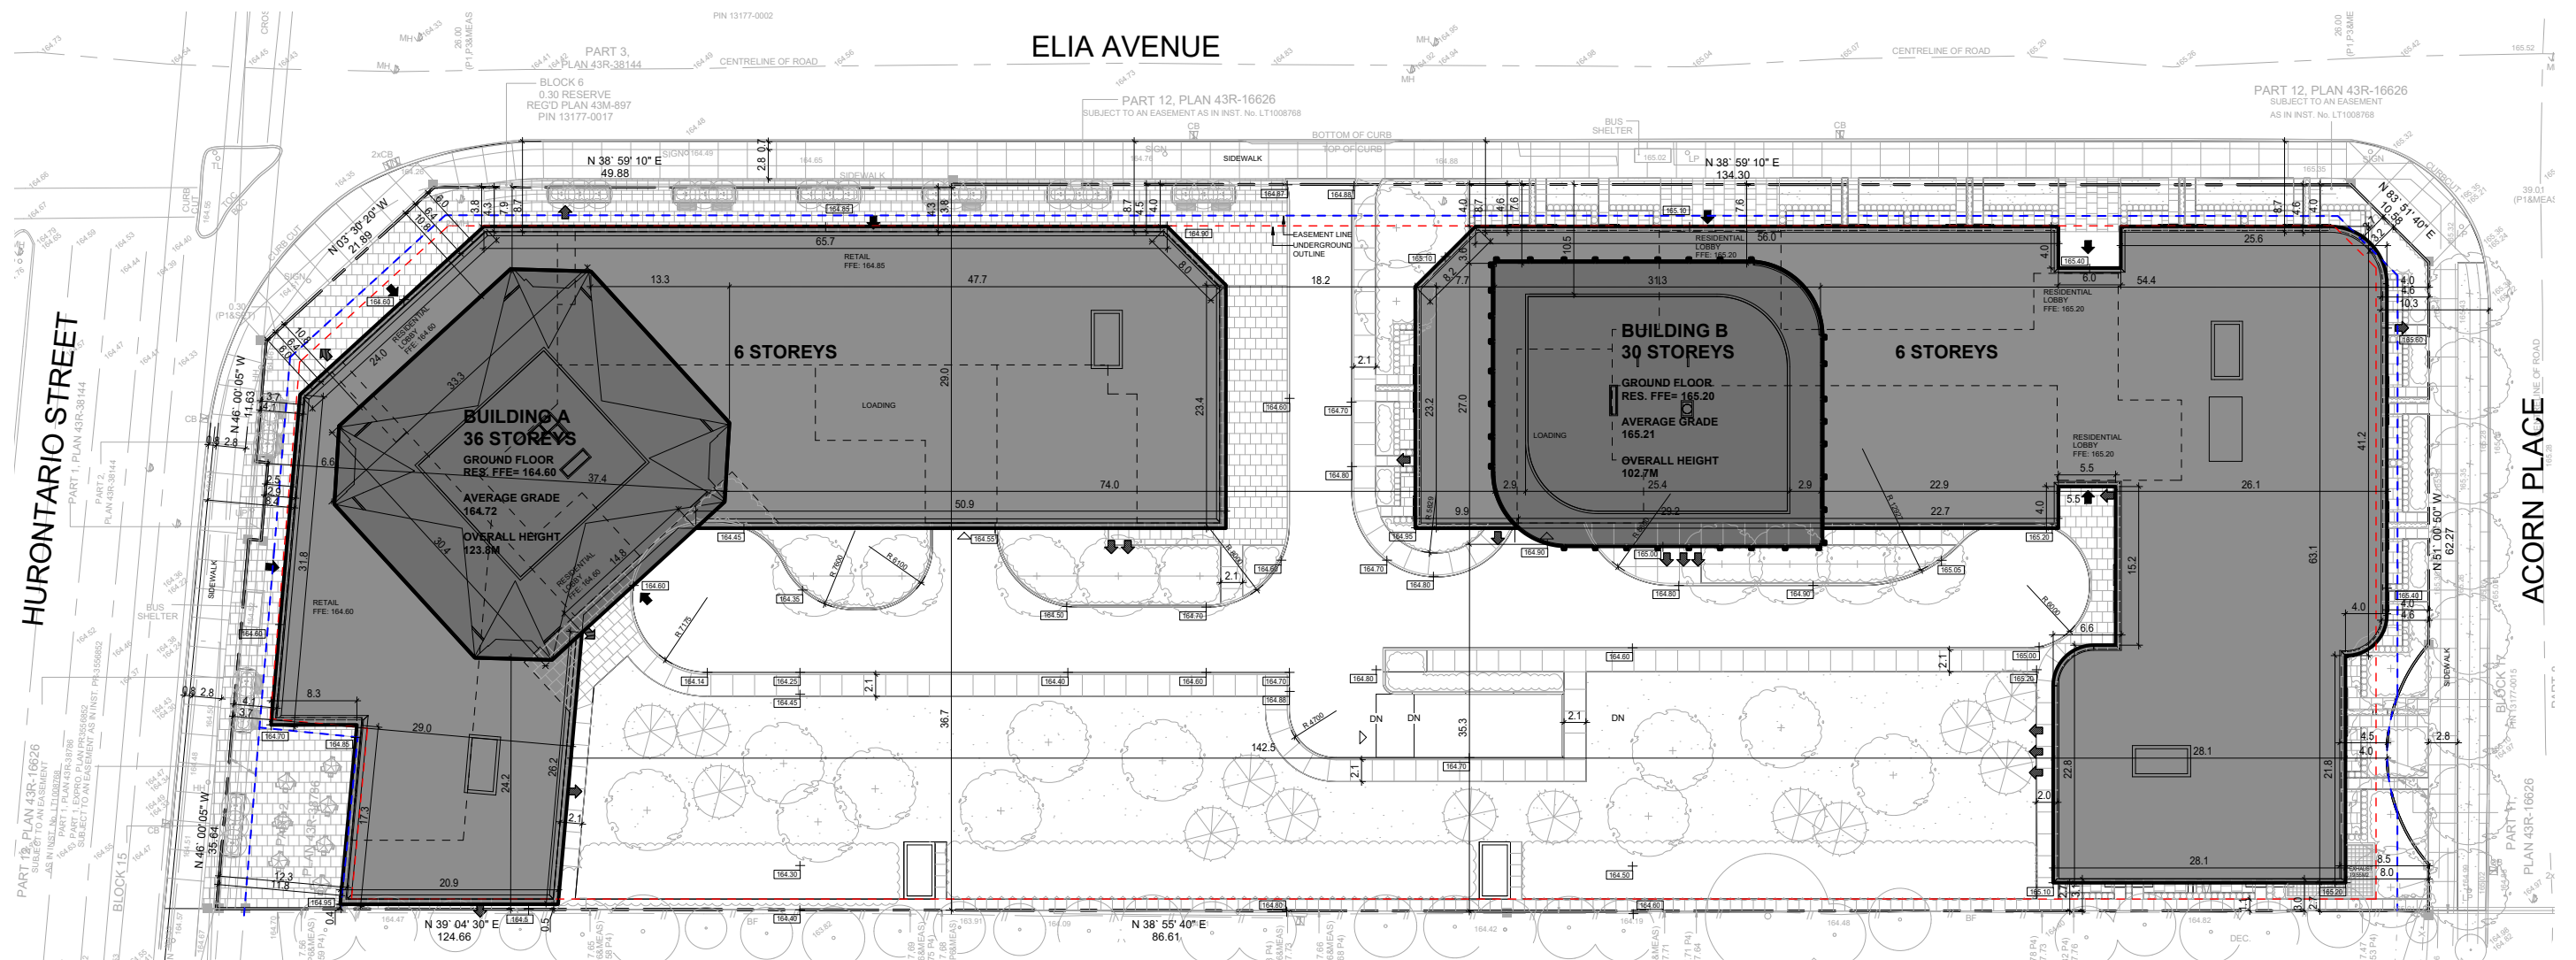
Block 4 Site/Roof Plan (Prepared by: BDP Quadrangle)
